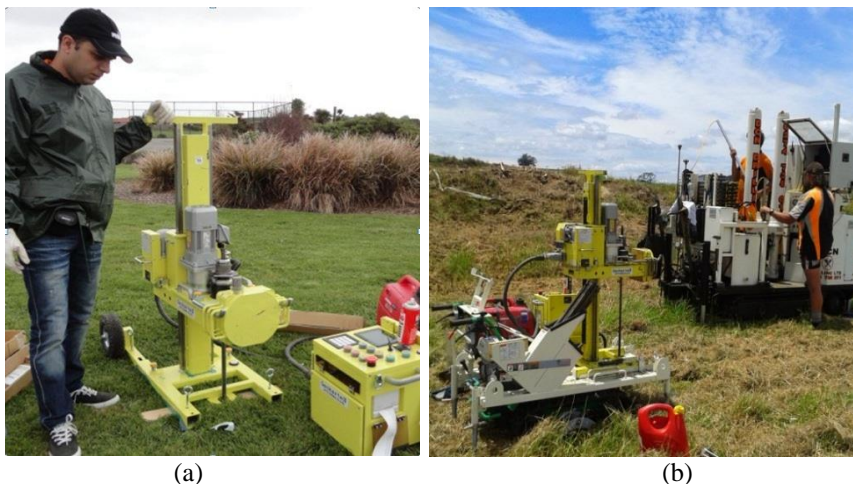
Screw driving sounding (SDS) equipment: (a) SDS machine during operation; (b) SDS machine mounted on a crawler side-by-side with a CPT rig.
